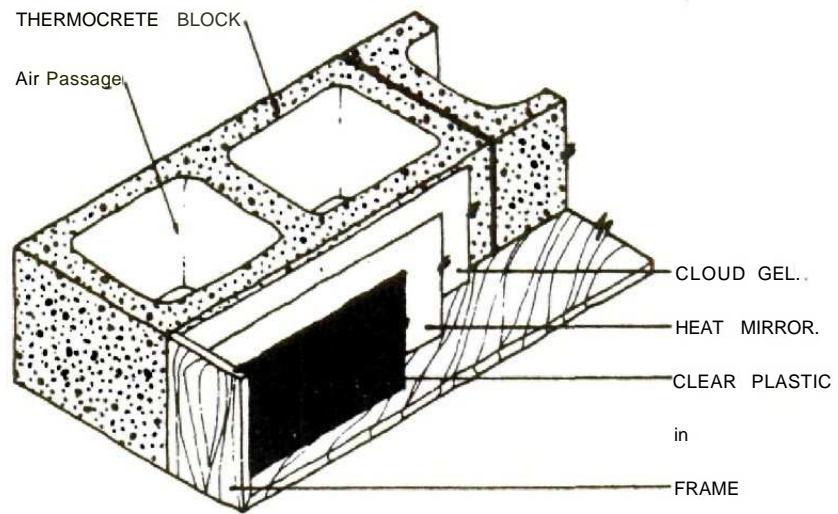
Block for passive heating and cooling wall (CHA-2).
